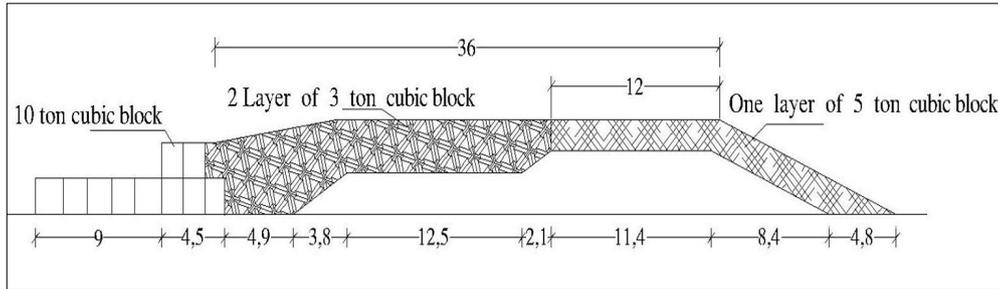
Cross section 1-1 of submerged breakwater at depth 3 to 5 m.
